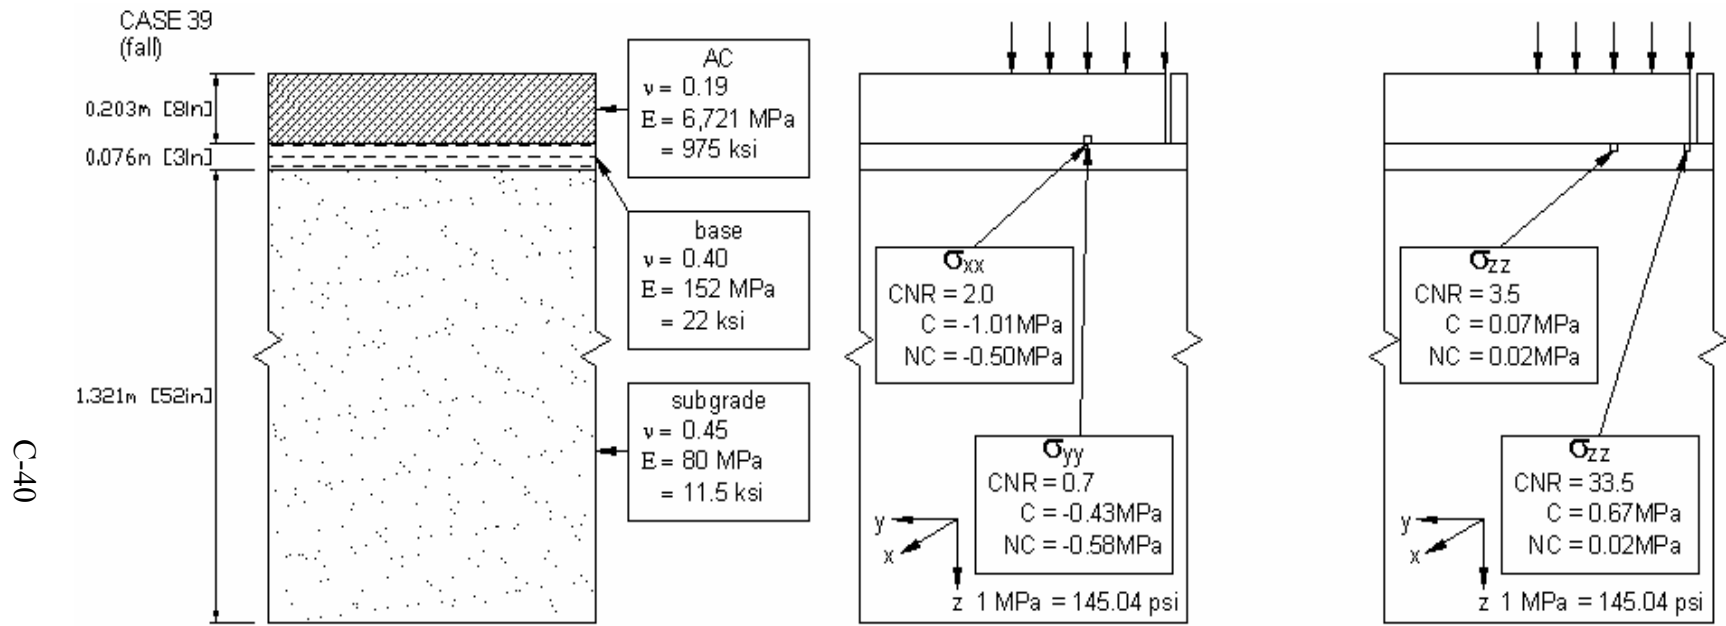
Summary cross section for case 39, (C – stress in cracked pavement, NC – stress in pavement with no crack, CNR – crack/no crack (stress) ratio)
